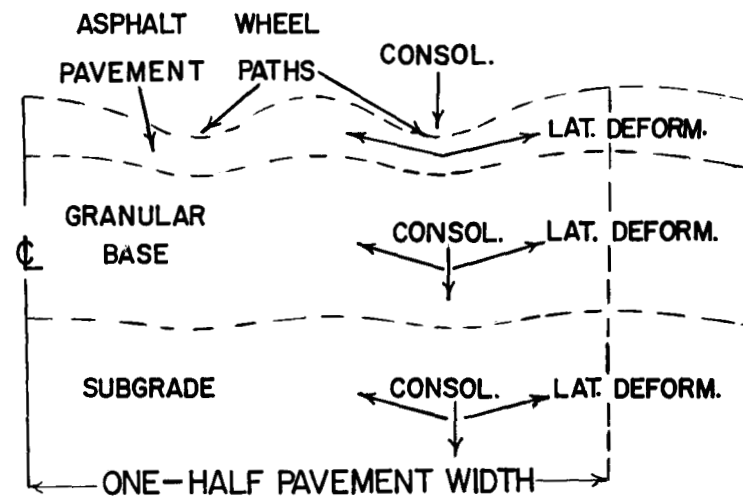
CAUSES OF PAVEMENT RUTTING
